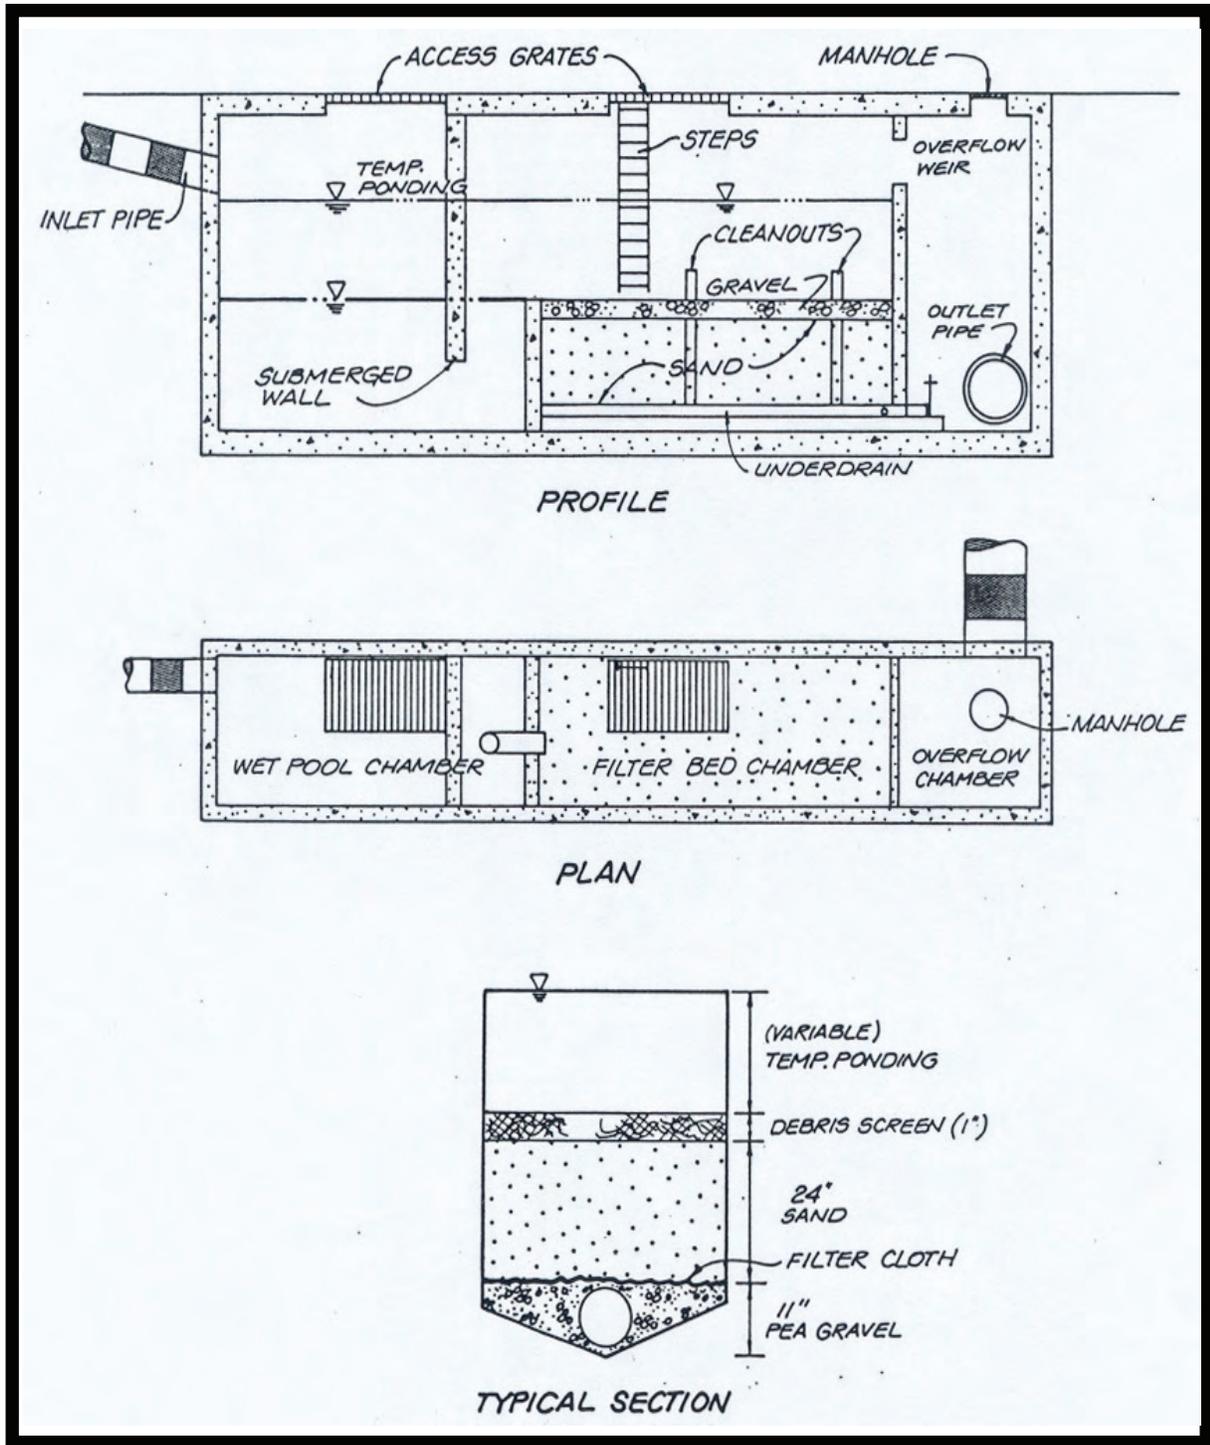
Underground Sand Filter Plan and Profile Example
